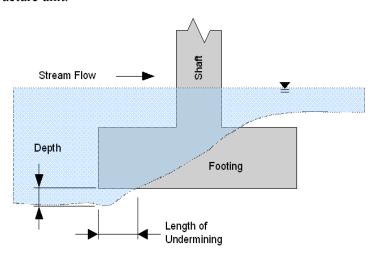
Longitudinal Cross Section Illustrating Undermining
